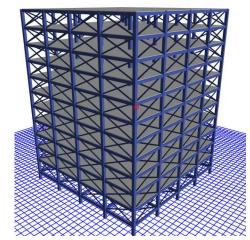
3D Rendered View of Building Retrofitted with X Bracing
